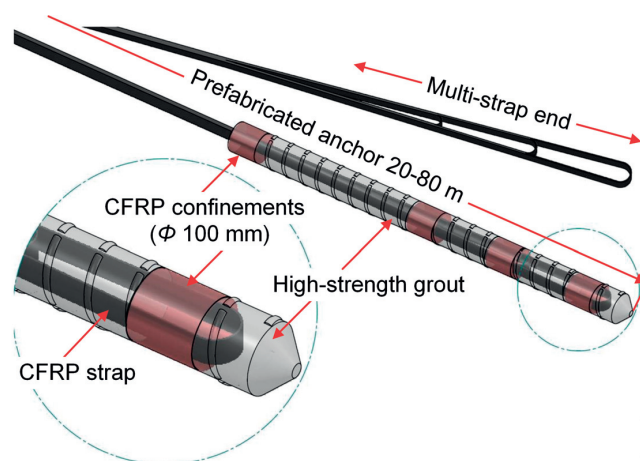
Permanent prestressed CFRP ground anchor with multi-strap anchor head on ground side
